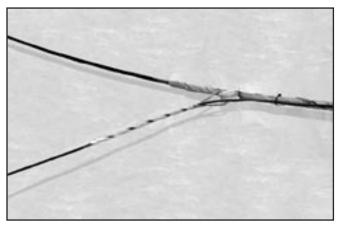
COMPLETED INSTALLATION OF DROP CABLE
